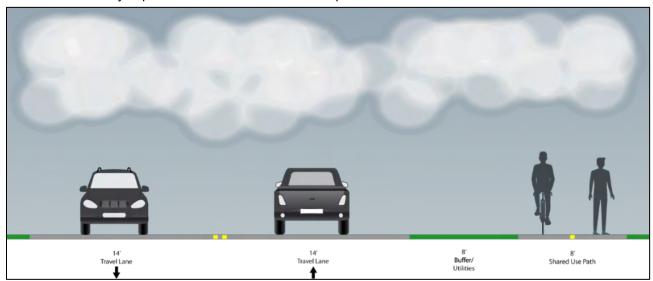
CONCEPT #7 - SHARED USE PATH/SIDEWALK TO HOWARD, TYPICAL SECTION
